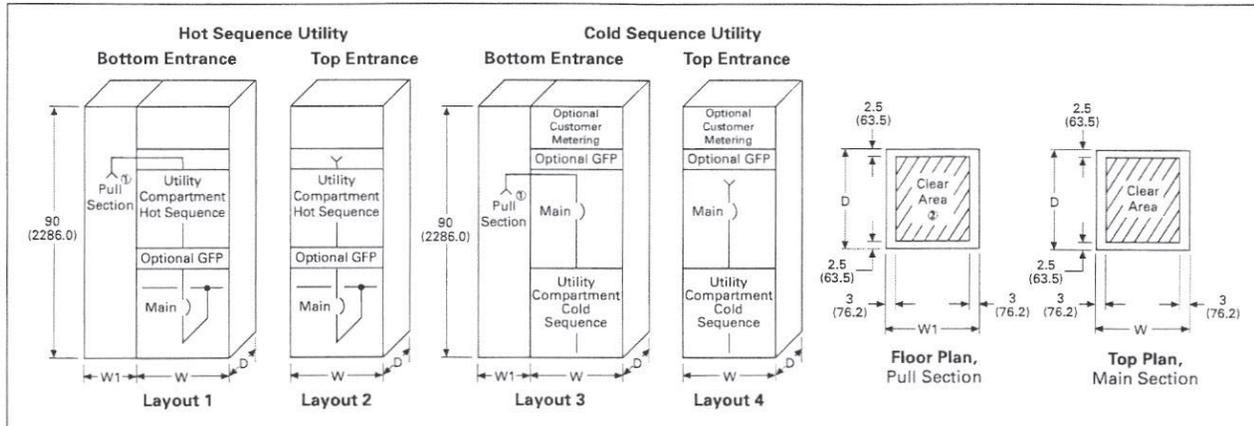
NEMA Utility Compartment Layouts — Dimensions in Inches (mm)
